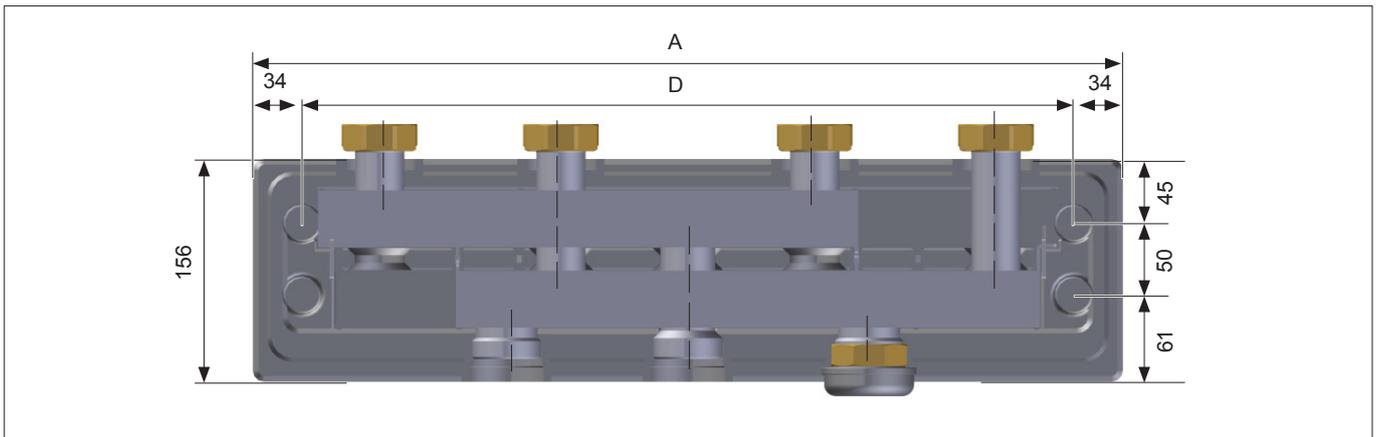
Drilling dimensions of 2-way boiler manifold; VB32-2 [mm]
